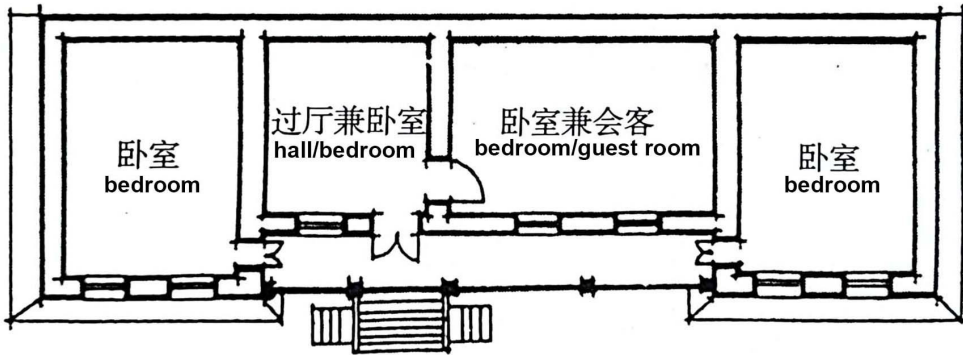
Floor plan of an example linear-style house.³⁴ Translated by author.
